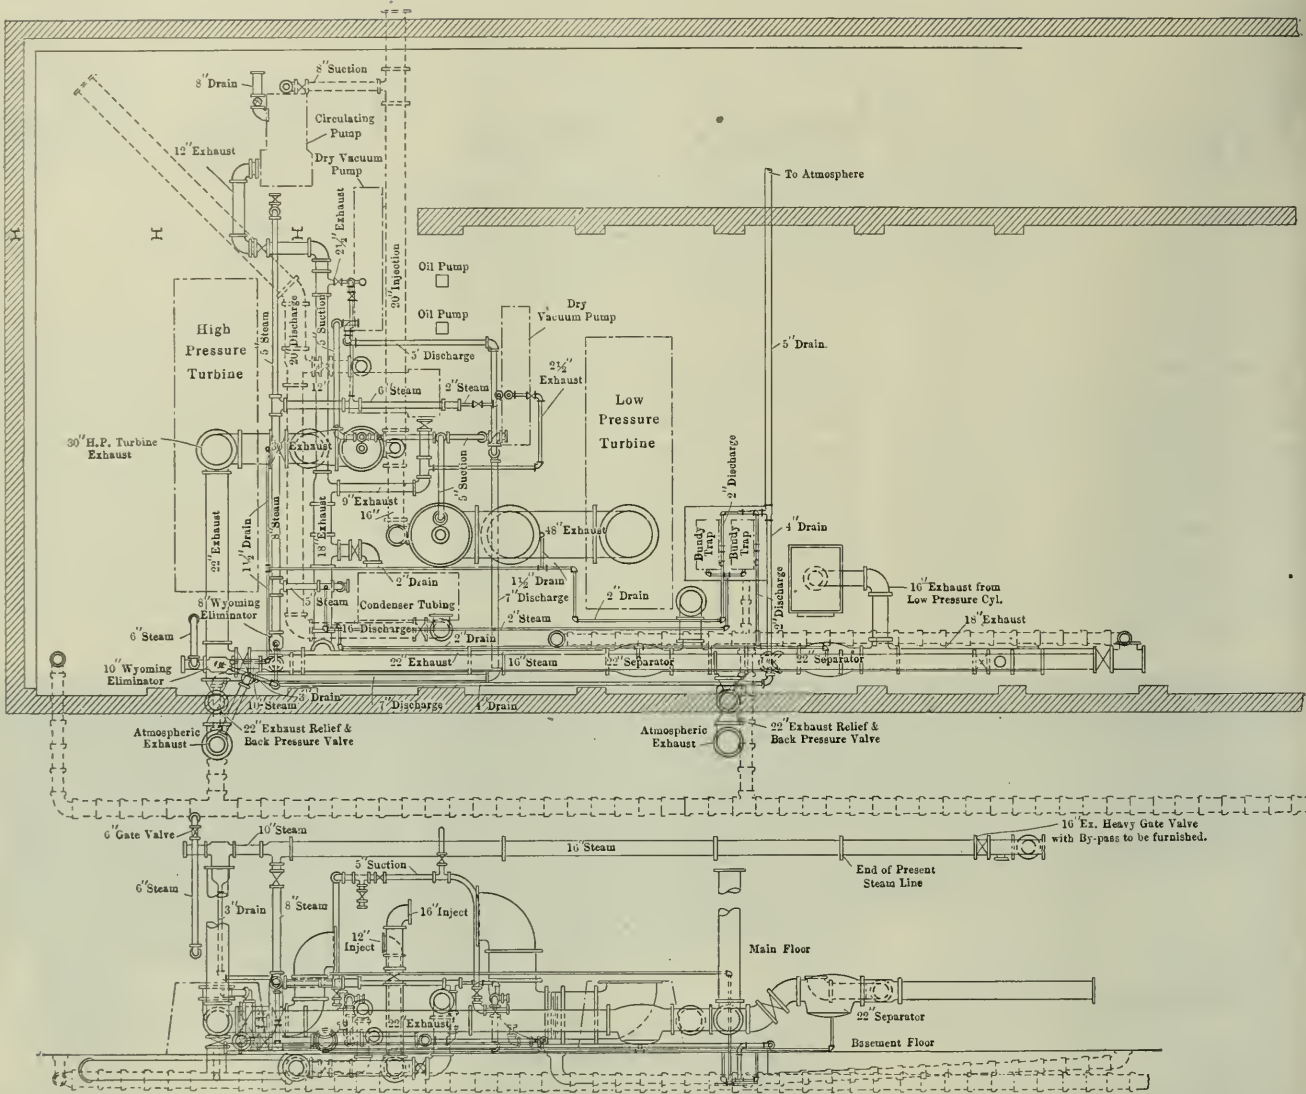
PIPING PLAN AND ELEVATION OF TURBINE EXTENSION TO POWER PLANT
